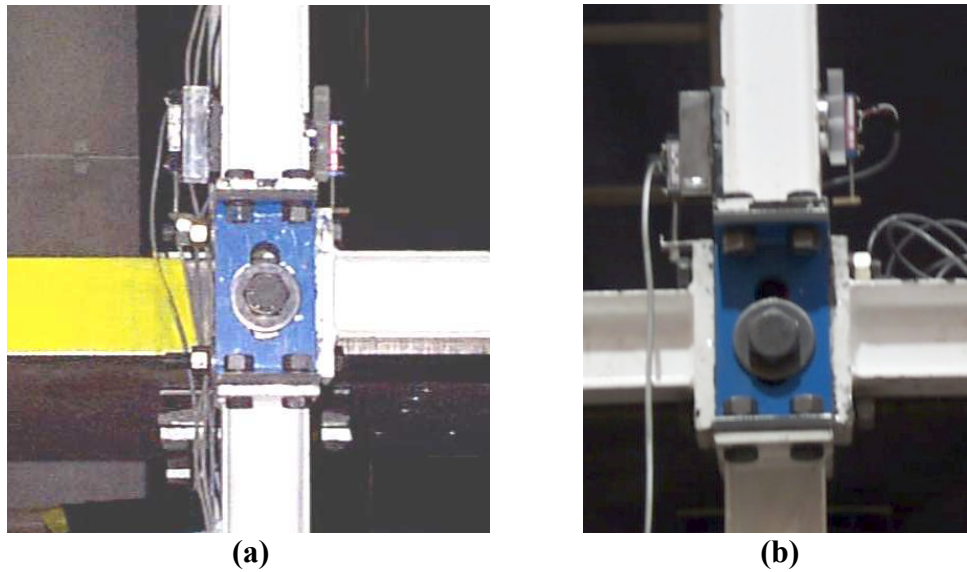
Beam Column Connections: (a) Exterior and (b) Interior
